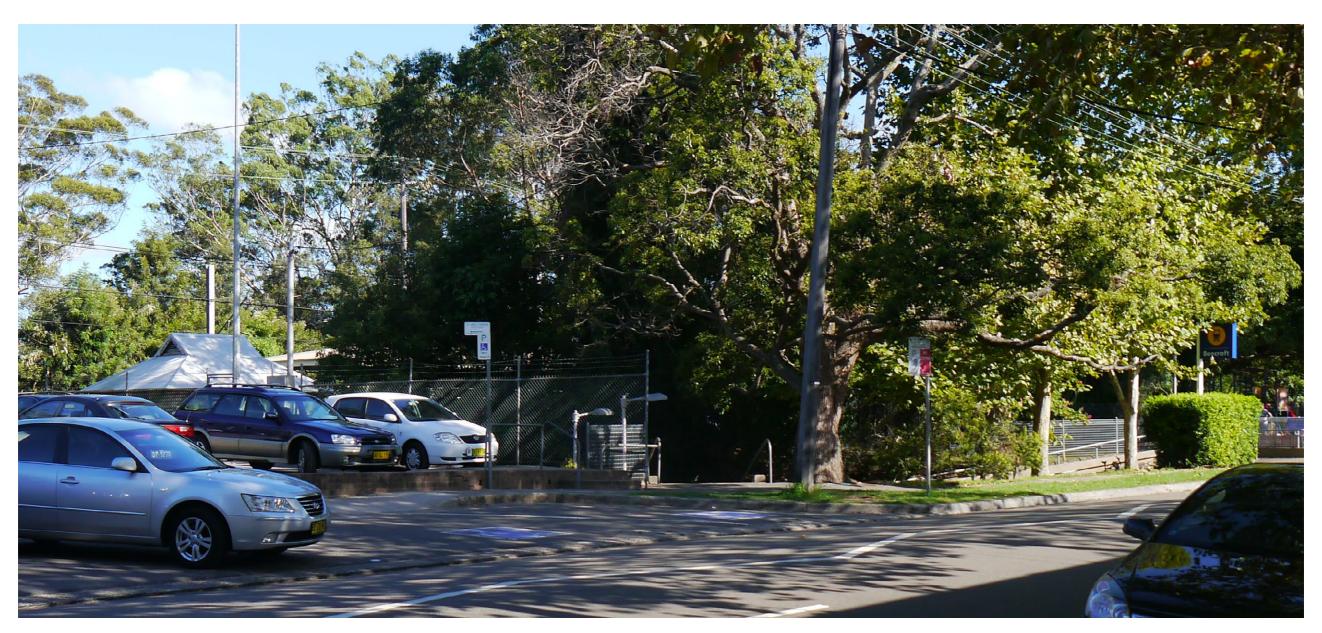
Pre-construction works view - looking south towards Beecroft Station entrance from Wongala Crescent
